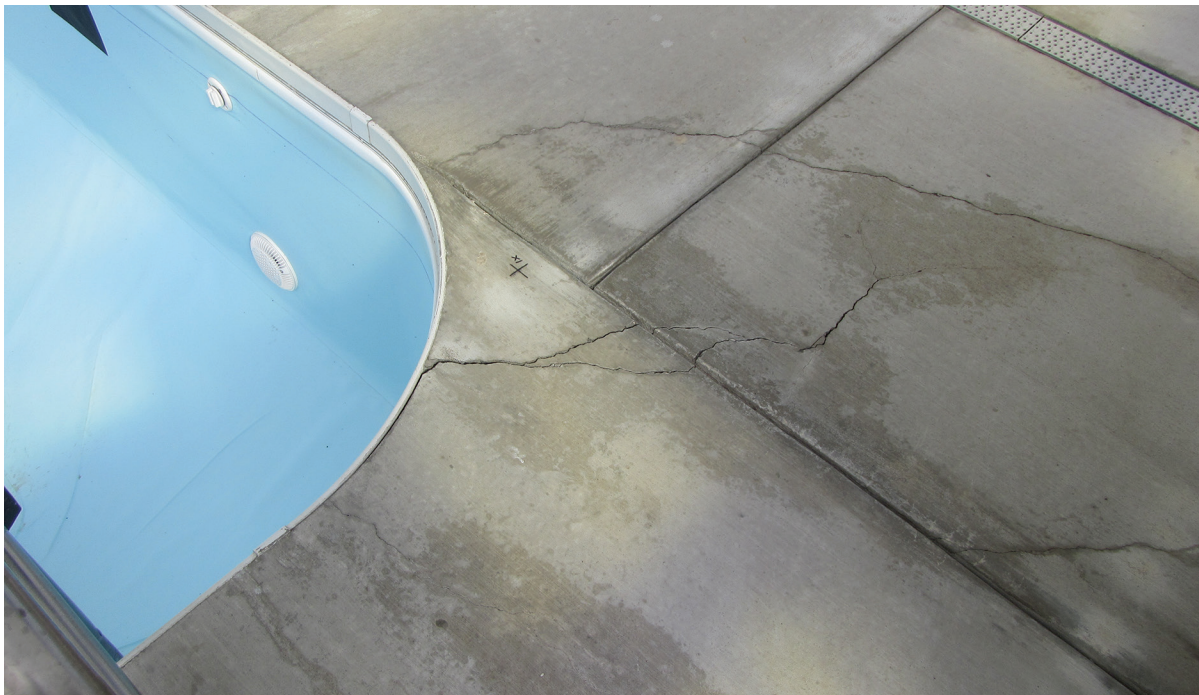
Cracks in concrete floor, pool
